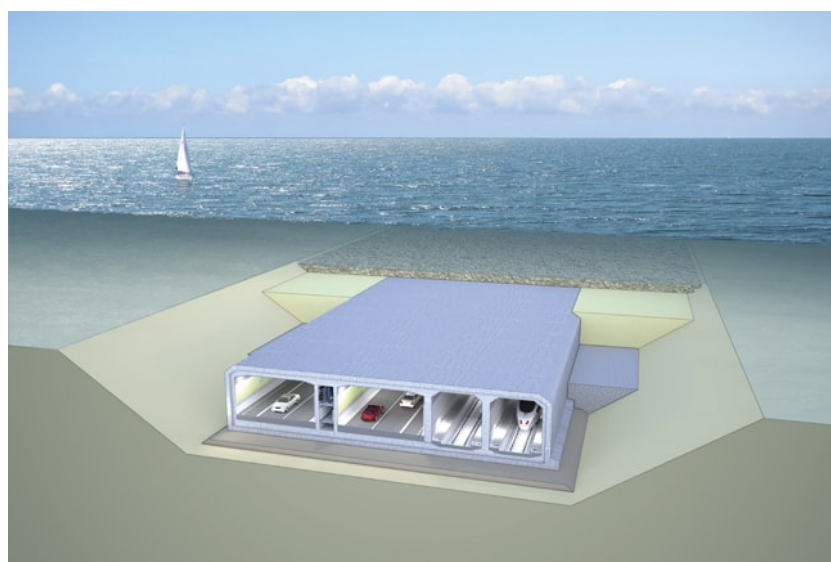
Placement of concrete tunnel and backfilling [3]
